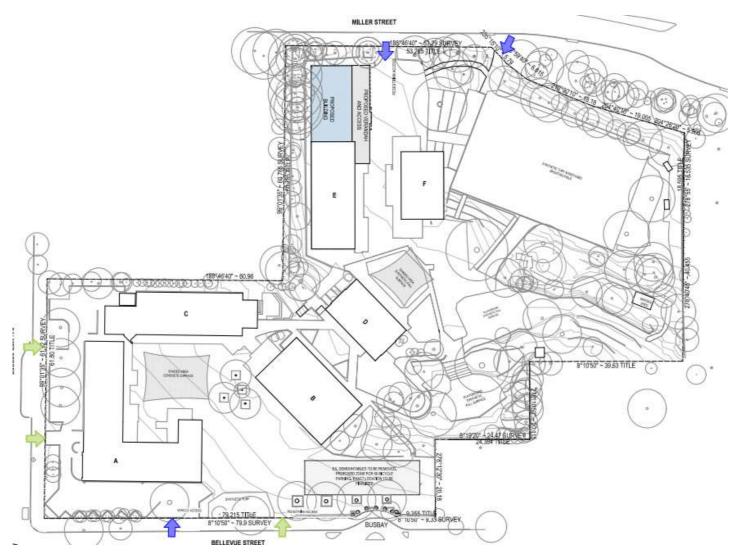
Proposed Scope of Works (Source: Fulton Trotter Architects, Proposed Site Plan (Rev P5))
